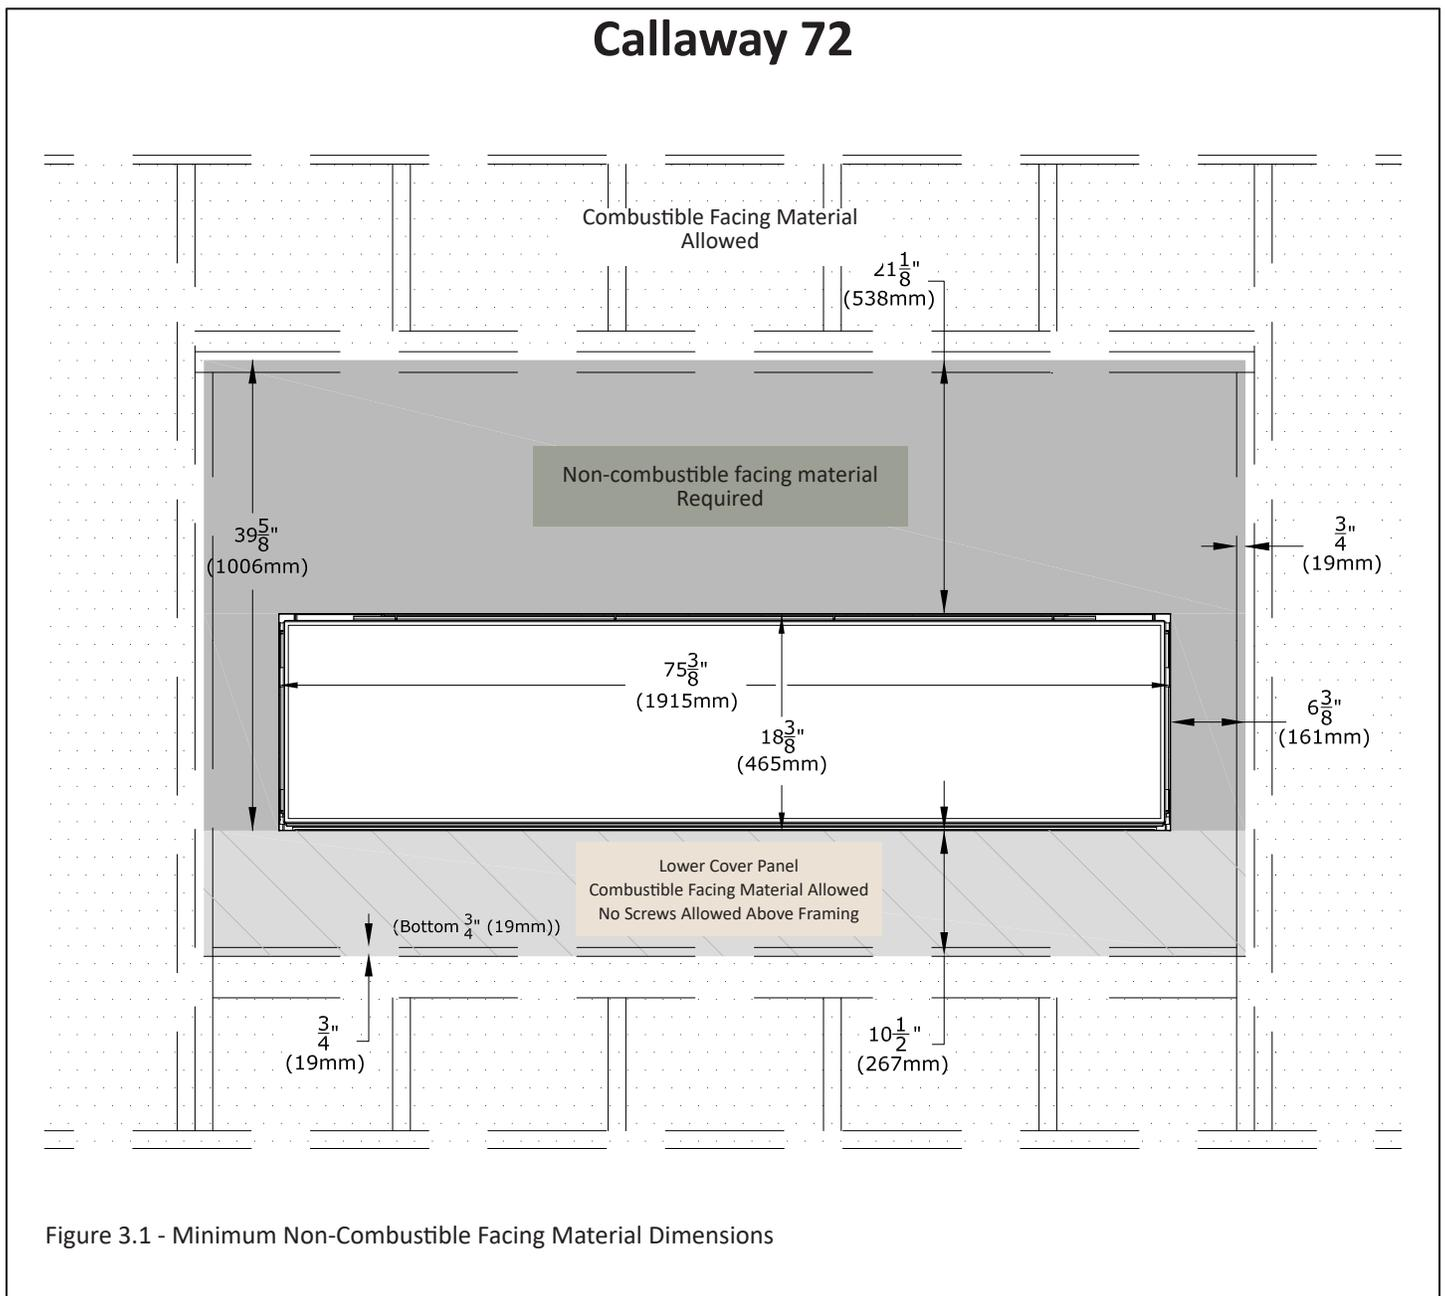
Minimum Non-Combustible Facing Material Dimensions
